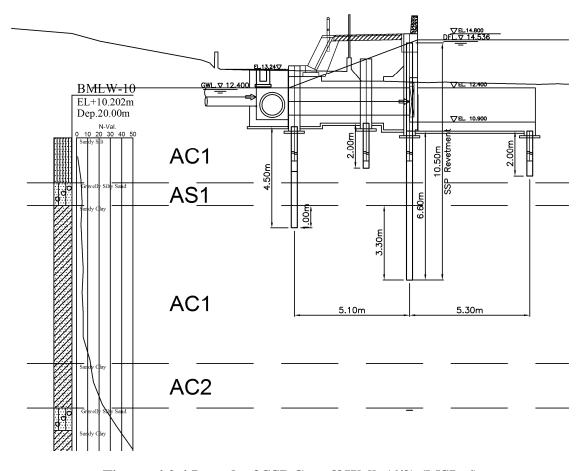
Length of SSP Cut off Wall (6/9) (MSL-6)
